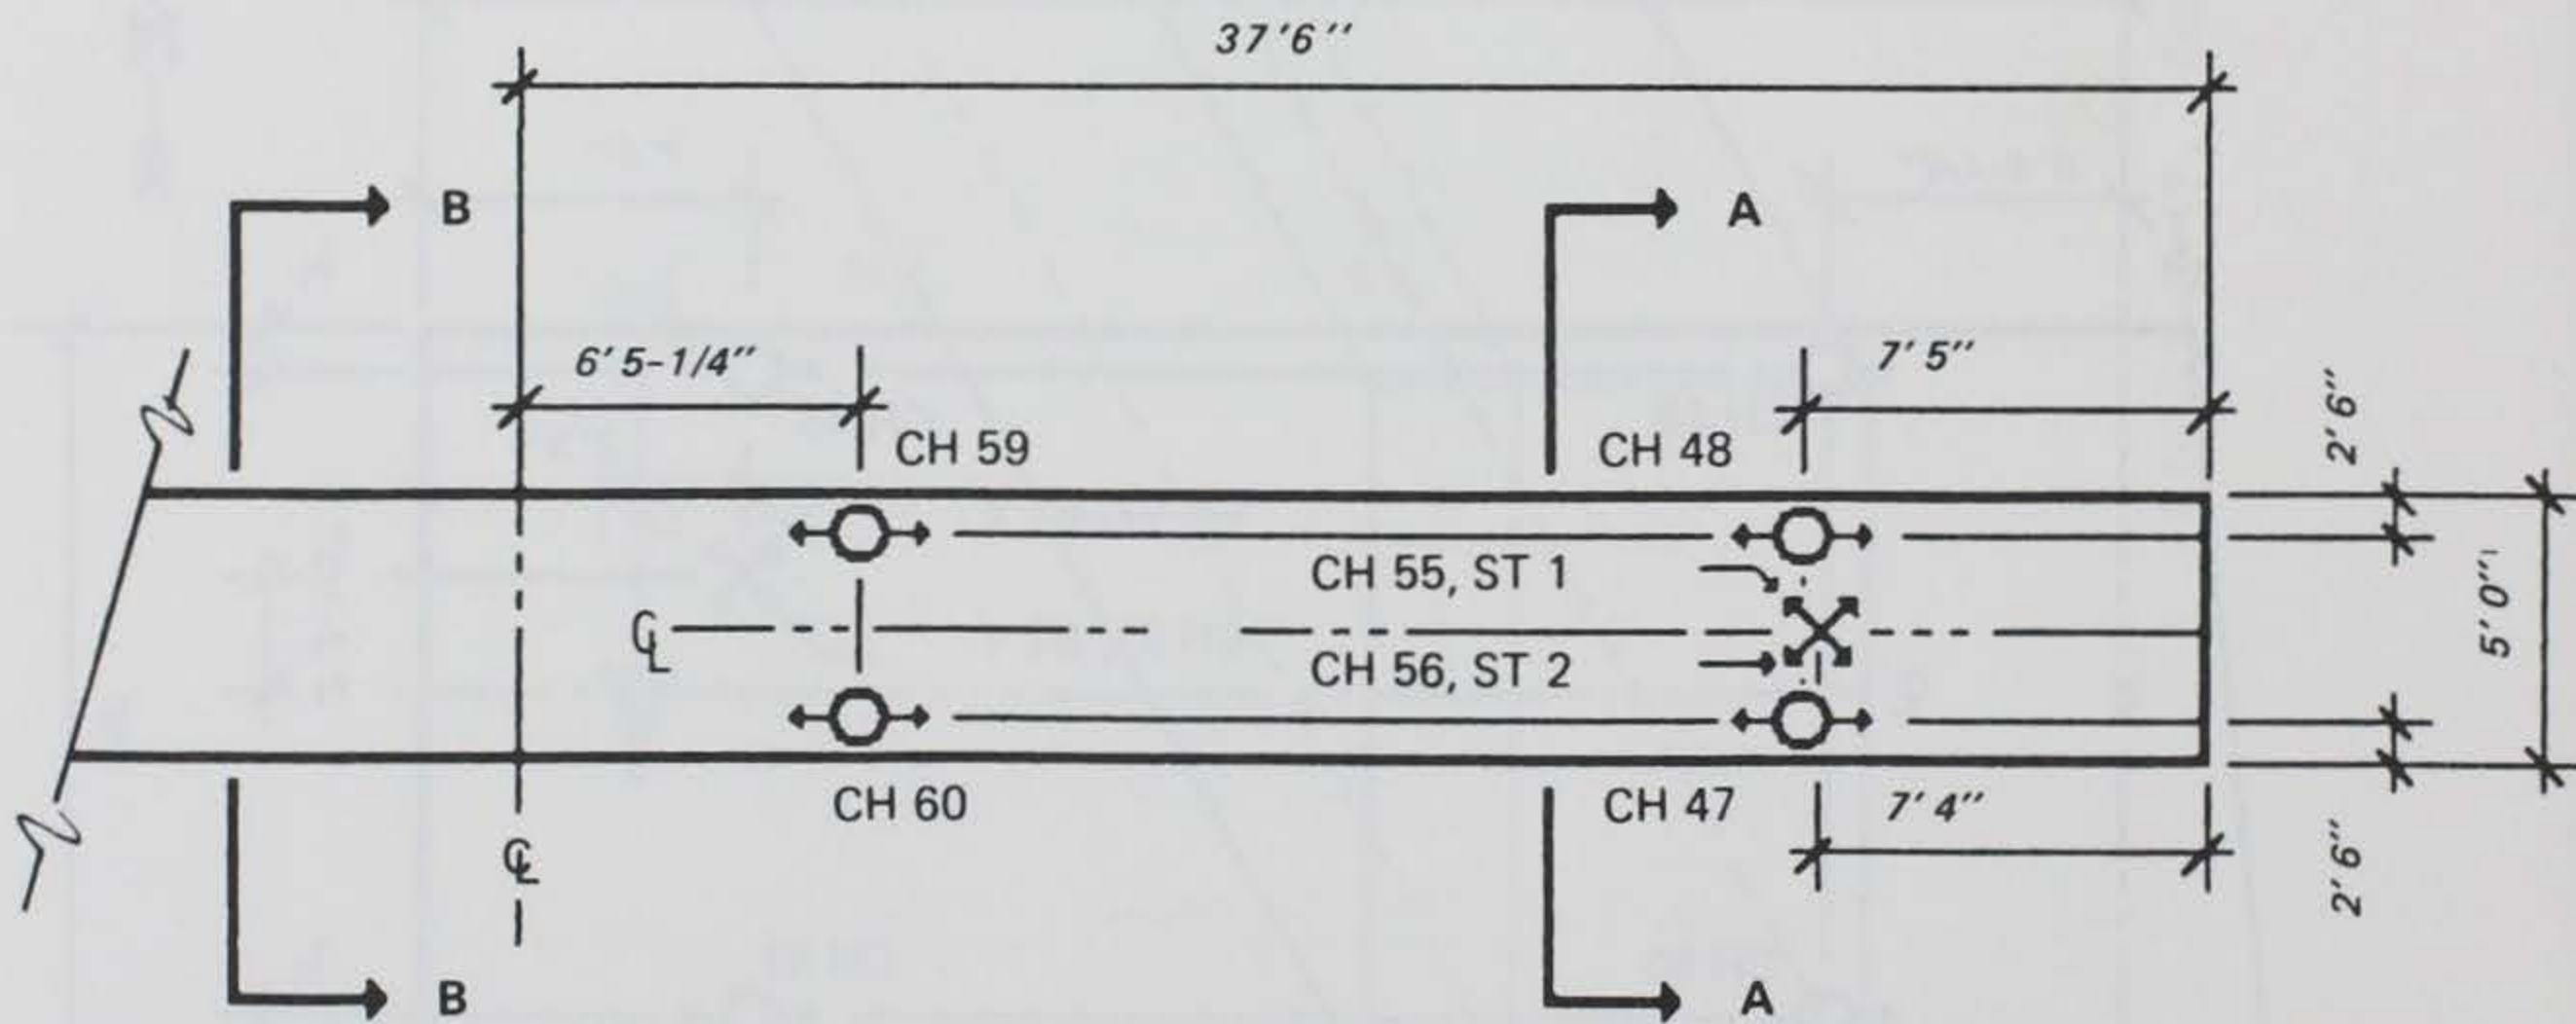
Concrete Strain Gage Layout, South Elevation
